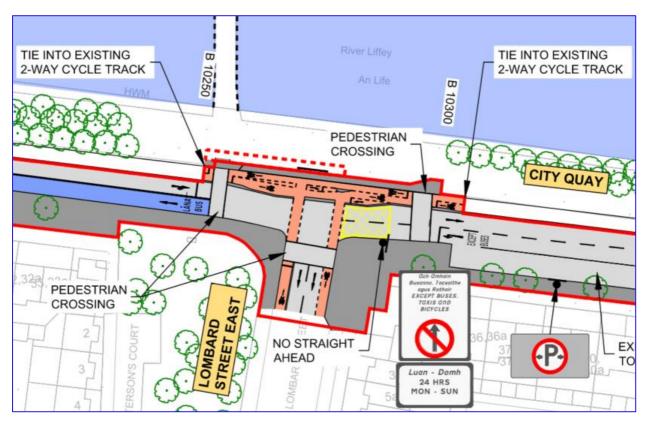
Proposed layout at the junction of City Quay and Lombard Street East
